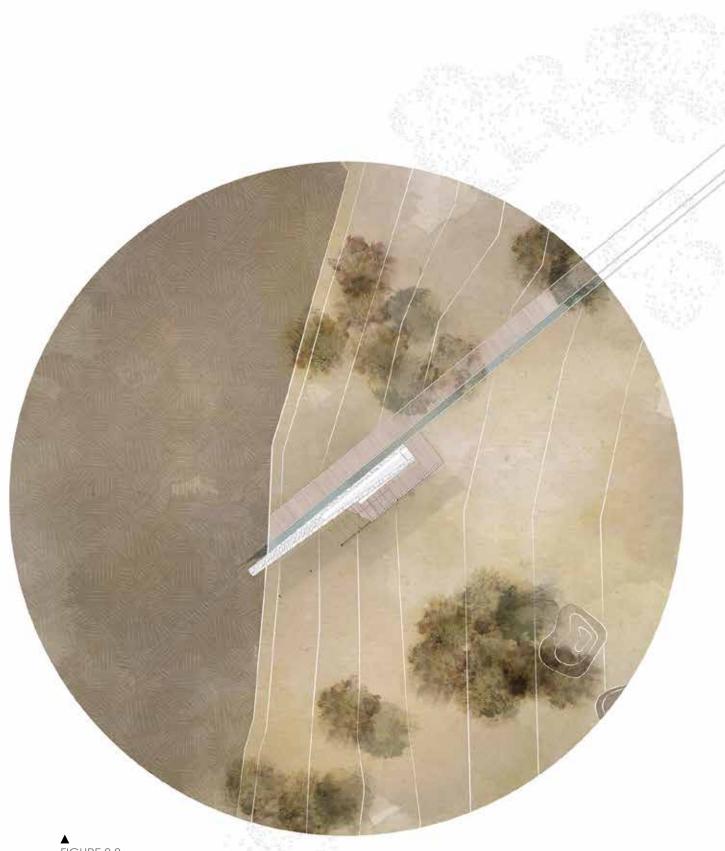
FIELDWORK STATION FLOOR PLAN NOT TO SCALE (Author, 2016)
